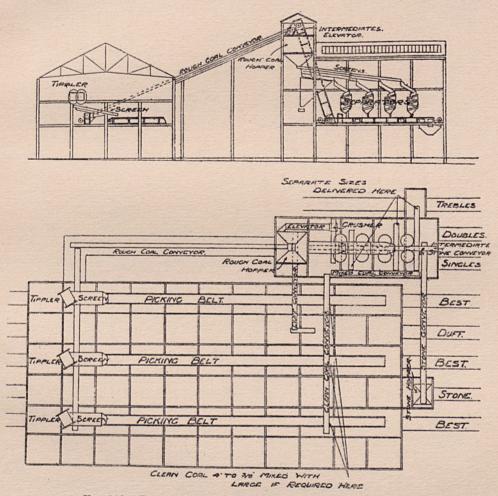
TYPICAL LAY-OUT OF SPIRAL SEPARATOR PLANT.
